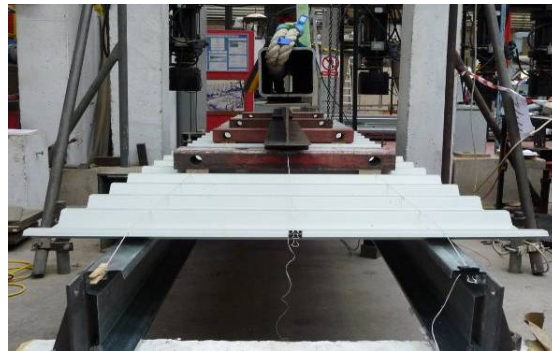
Screws connecting roof sheeting to sigma purlins
